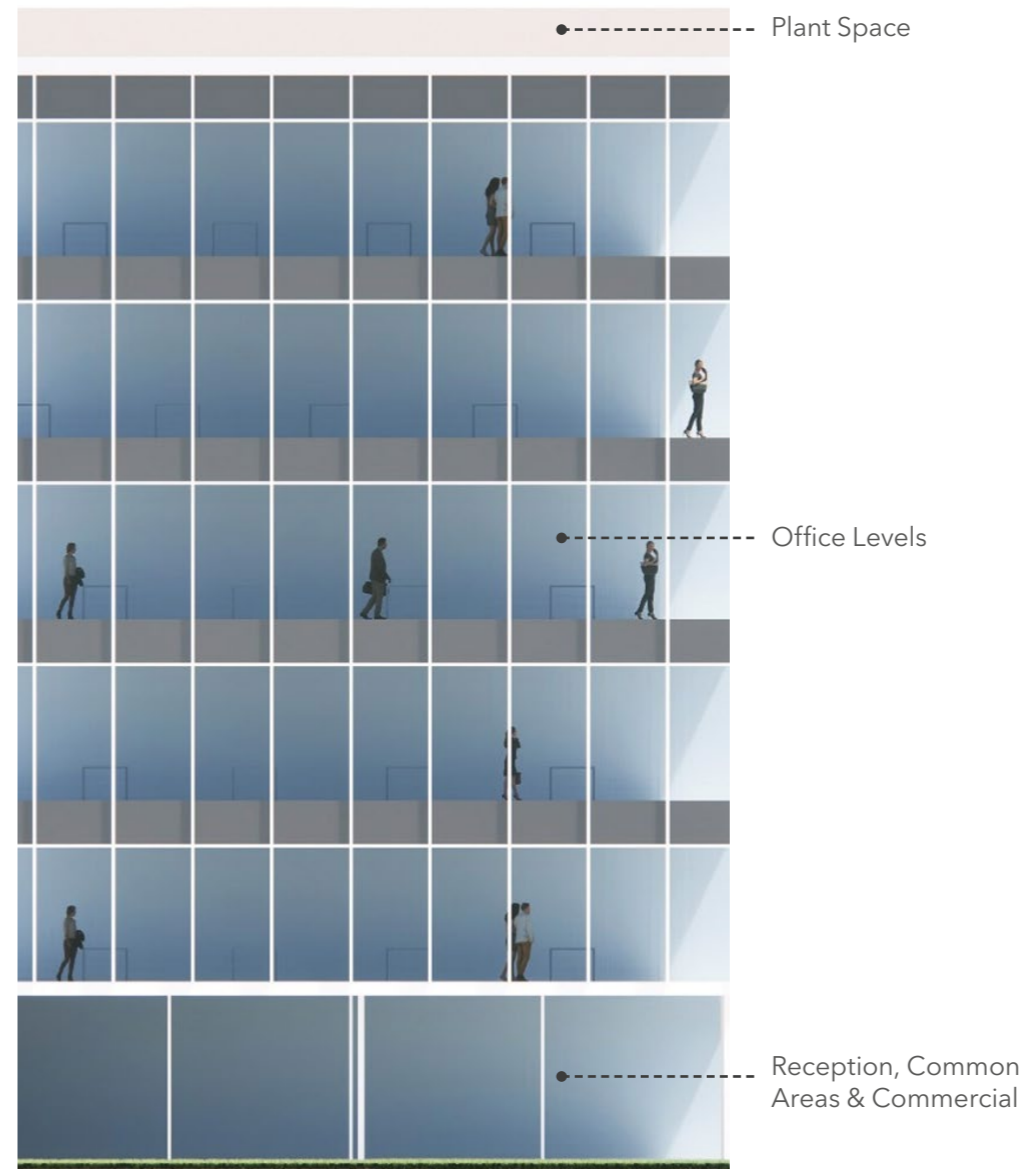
Indicative Elevation showing Typical 'Office Building' Design
